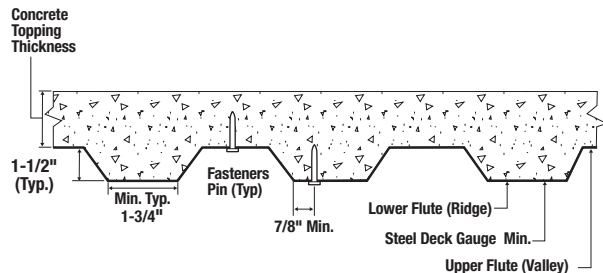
Fastener Installation Through the Soffit of 1-1/2 inch Deep Concrete-filled Composite Steel Deck Floor and Roof Assemblies
